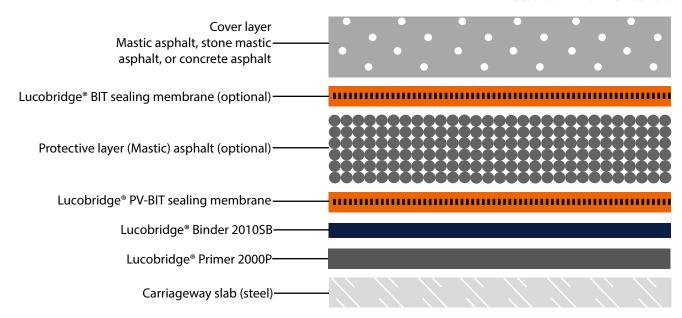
Two-membrane layers (mandatory) Dutch Bridge Design
